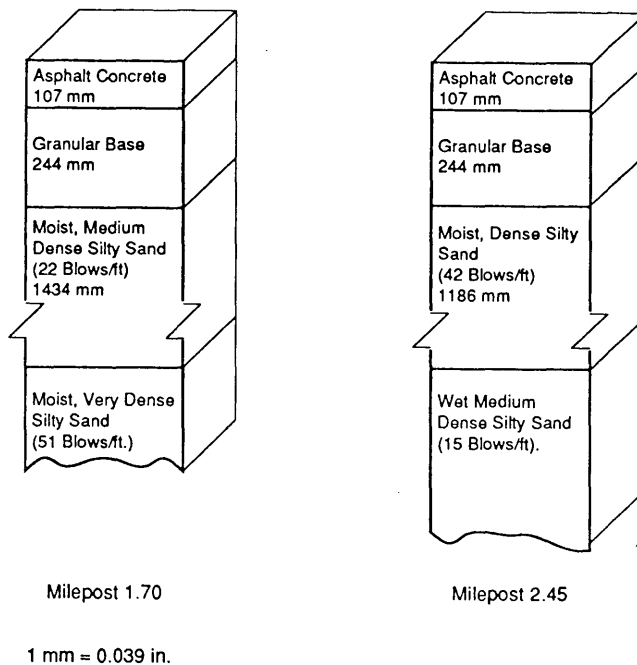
Cross section for SR-525 pavement sections, MP 1.70 and 2.45.
